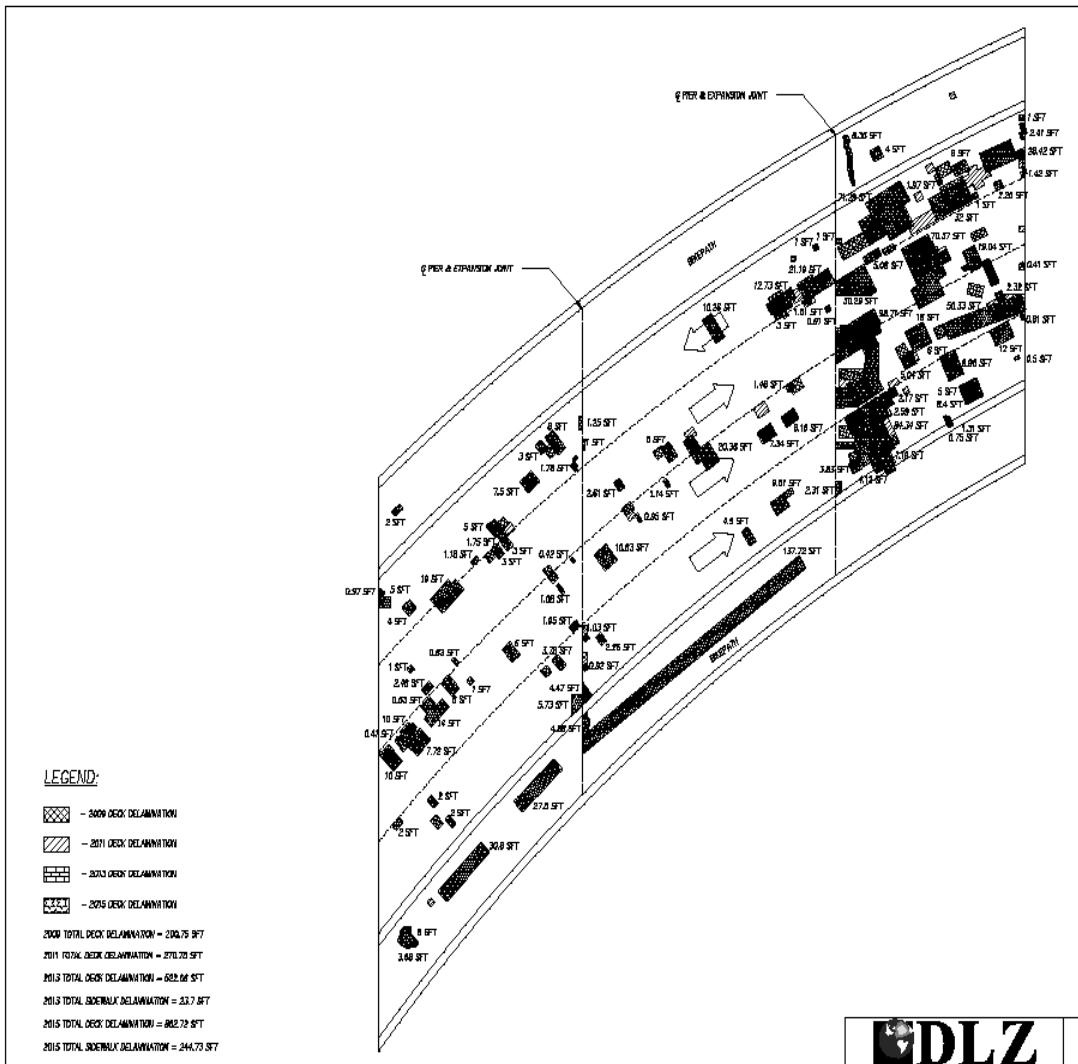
2015 Bridge Deck and Sidewalk Delamination Survey
